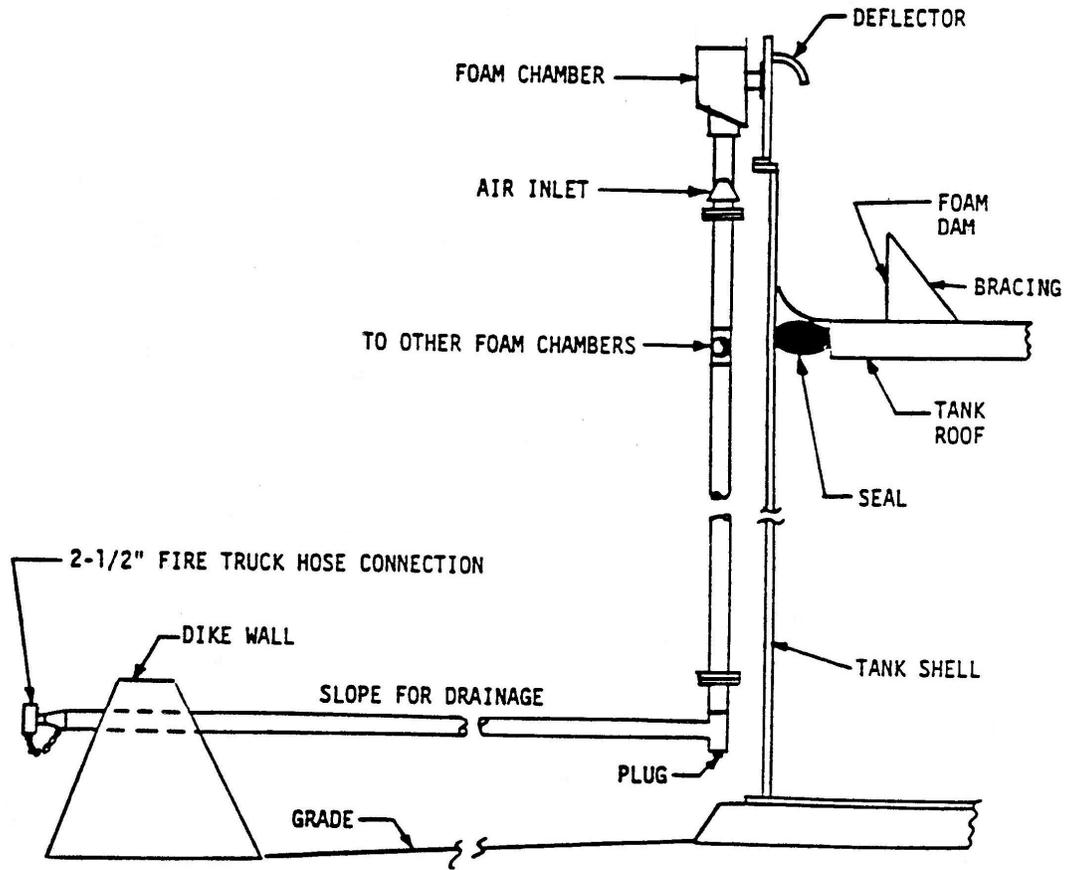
(a) Fire Protection for Floating Roof Tank
